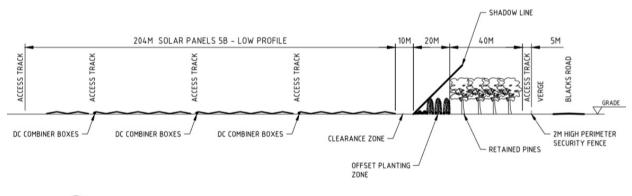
Cross section 'A' (facing west) for Happy Valley Reservoir solar PV layout. Demonstrating 5B profile against proposed landscaping and retained pines, with Blacks Road at Right Hand Side. Excerpt from Appendix B- Design Drawings.
